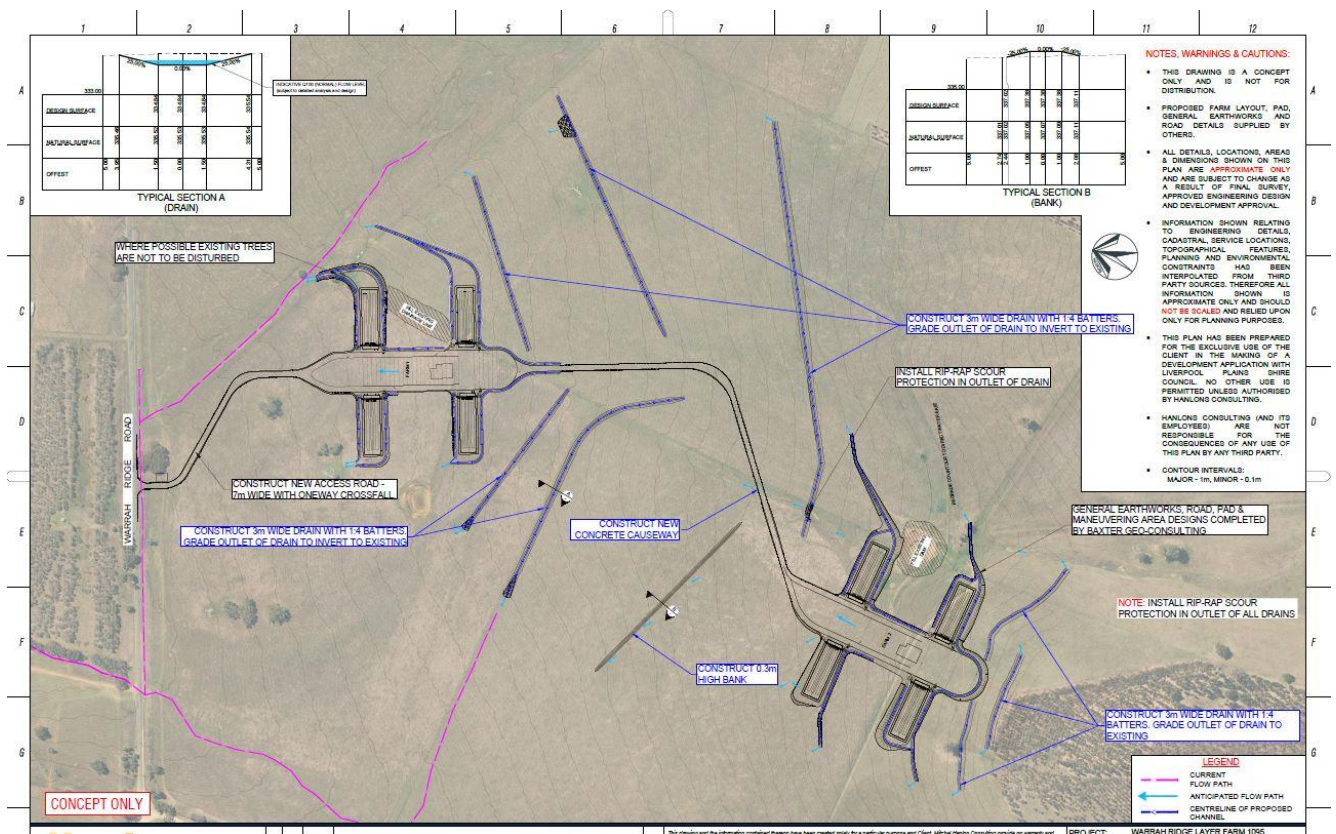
Concept Drainage Layout Plan. Source: Hanlons, 2023
